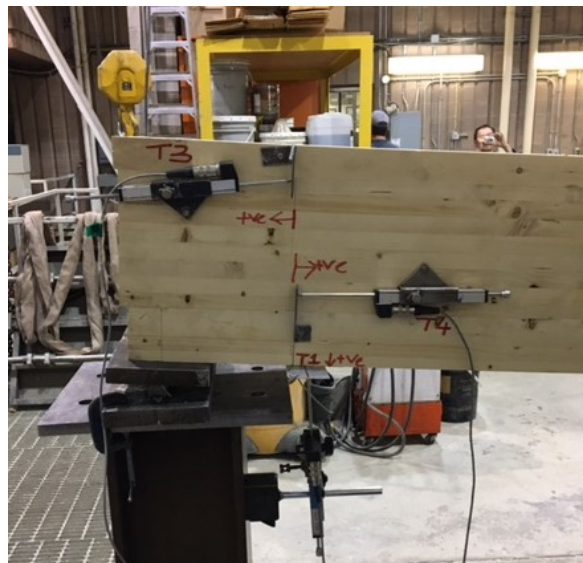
Excessive beam end rotations of a screwed test assembly during experiment
